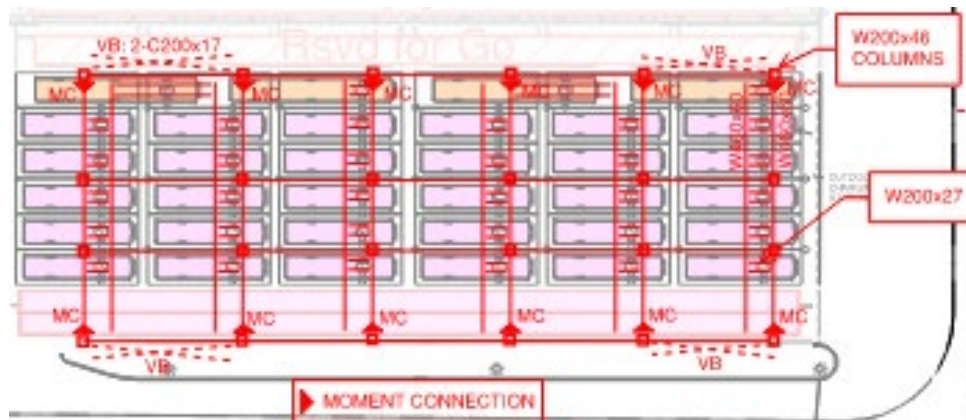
Gantry Framing Plan – Structural Support for Exterior Pantographs.
